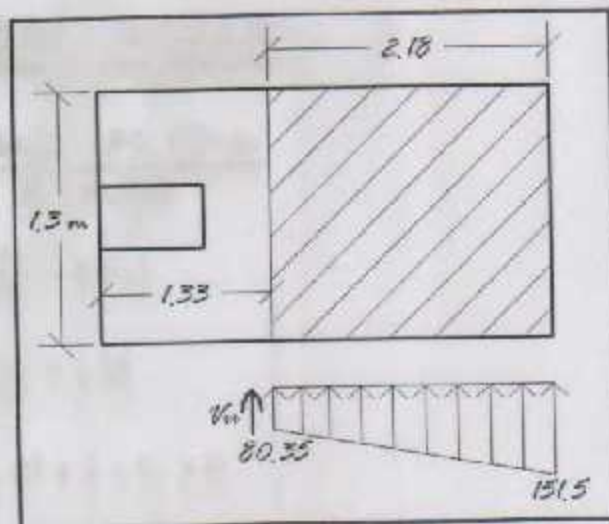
critical section for checking one-way - Intermediate frame footing
